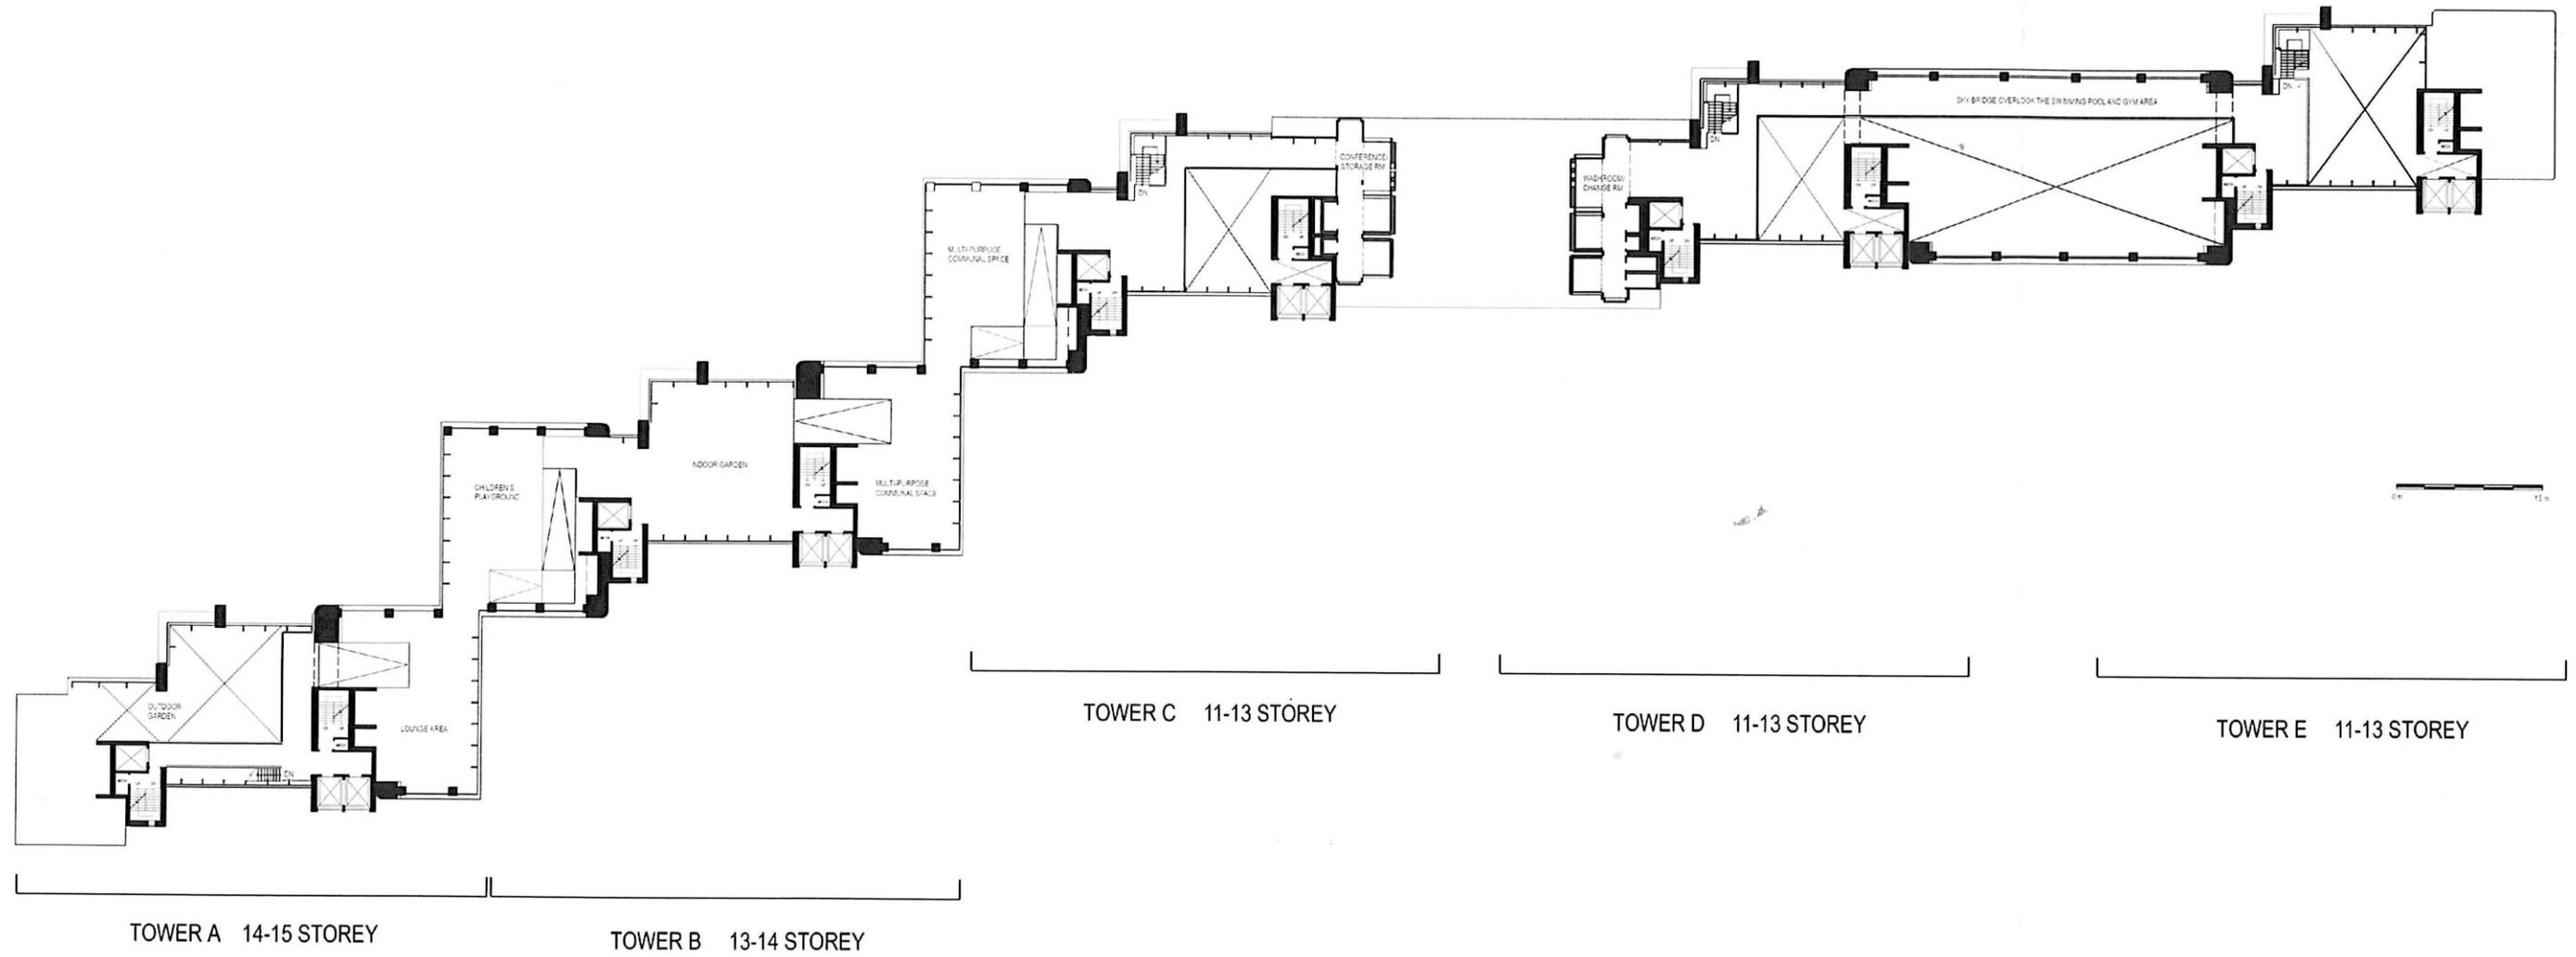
UPPER LEVEL OF THE 'GREEN POCKETS' COMMUNAL SPACE, FLOOR PLAN.
